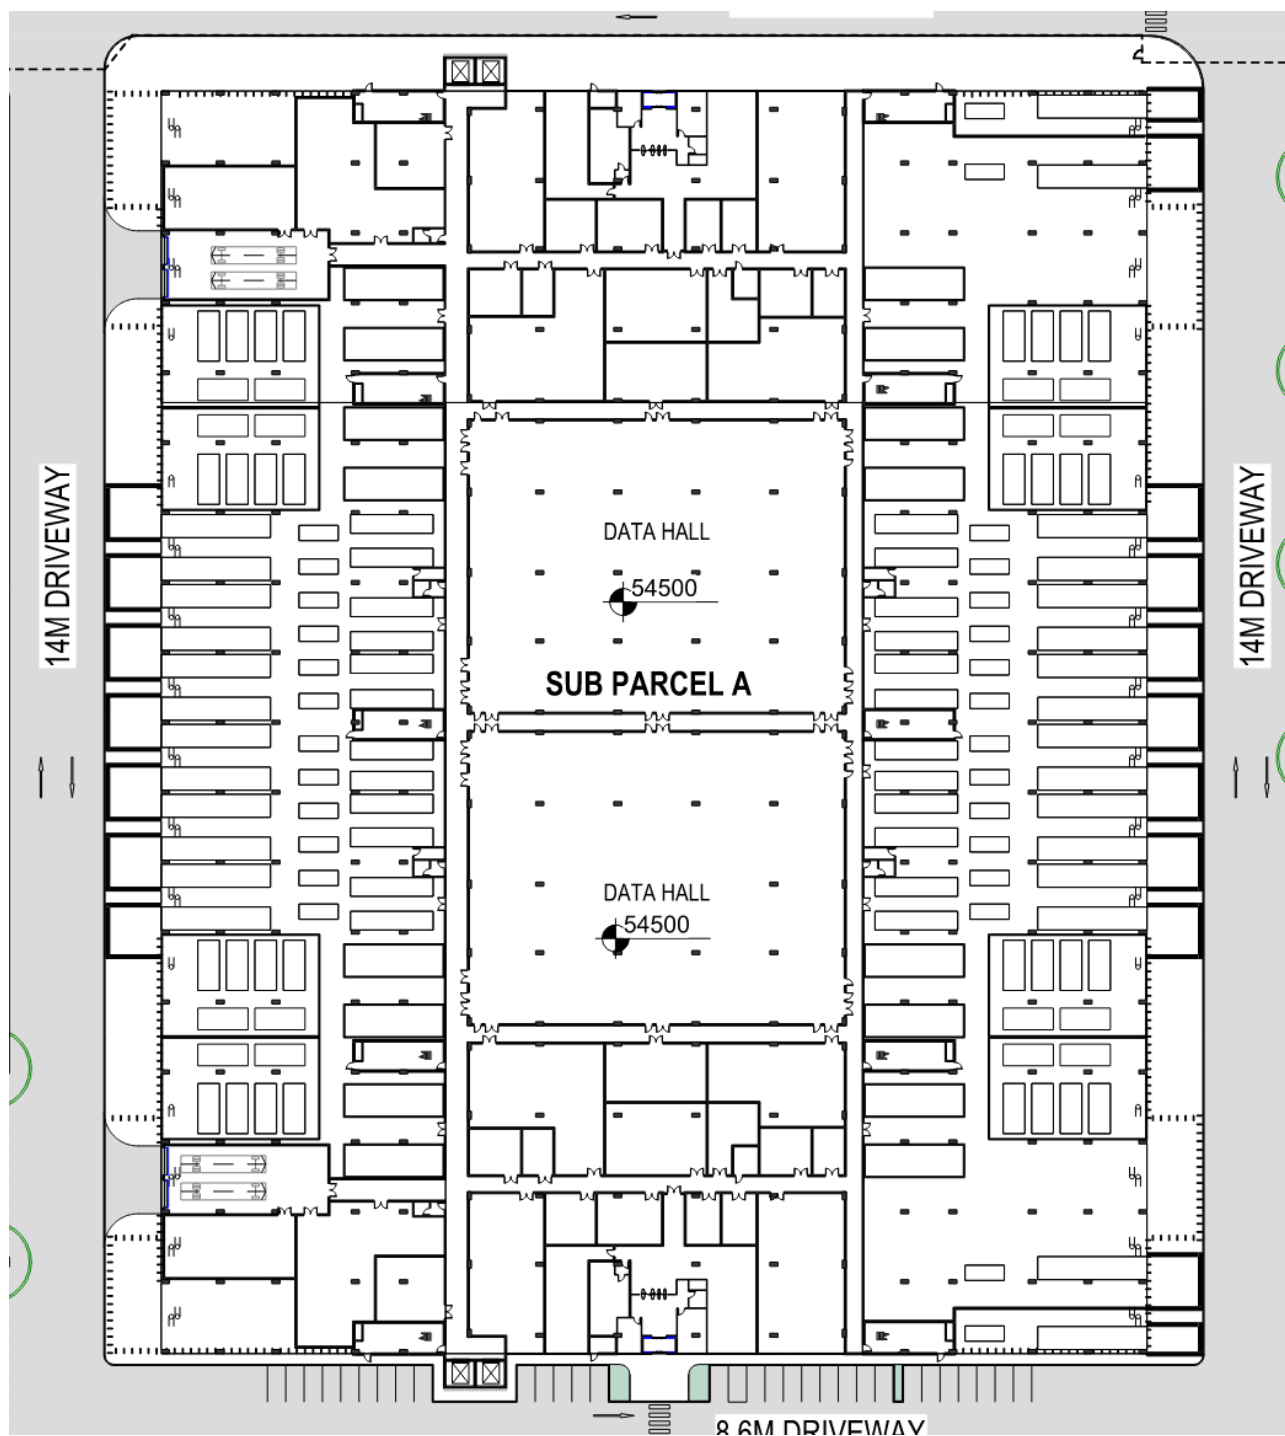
Ground Floor Layout of Data Hall Building – Typical per Sub Parcel
